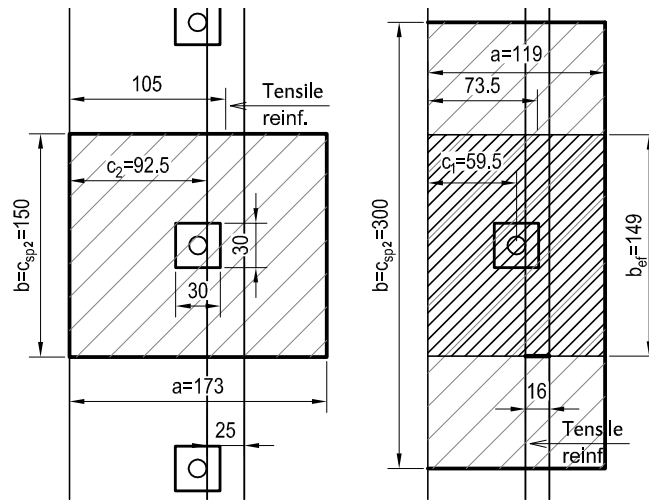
Block dimensions considered for the double headed rebar for specimens with 25 mm rebars (left) and 16 mm rebars (right)
